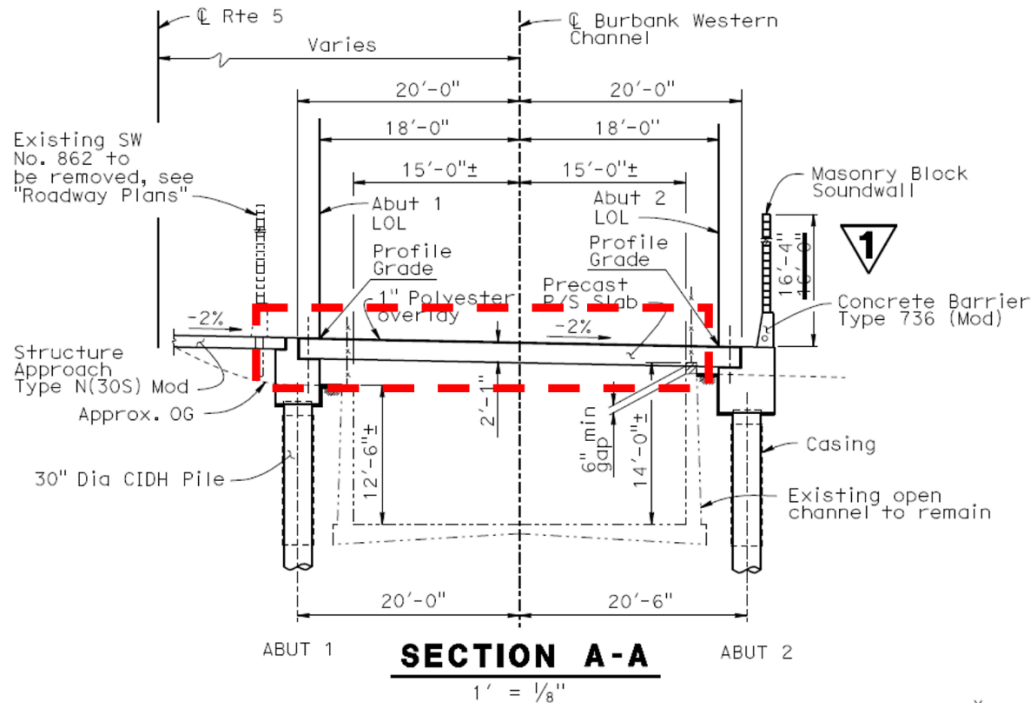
Polyester Concrete Used to Provide a Smooth Roadway Surface on a Precast Slab
